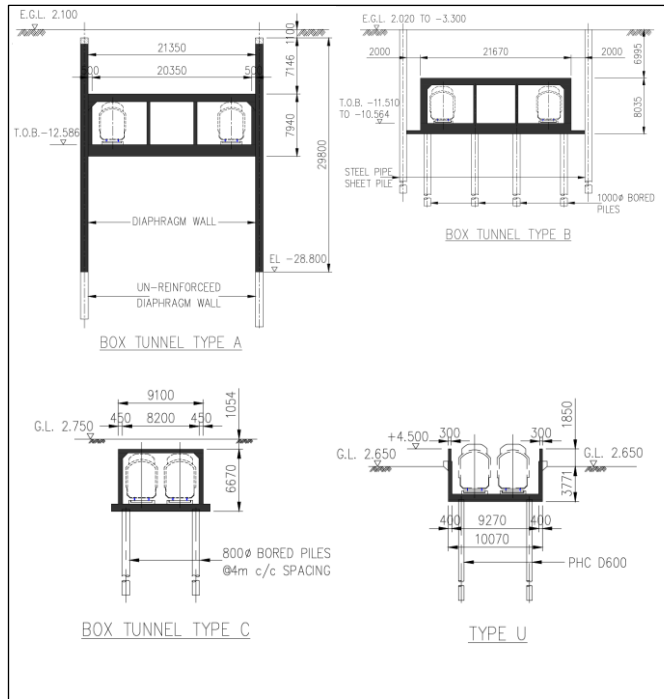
Typical cross section of cut-and-cover tunnel and transition structure
